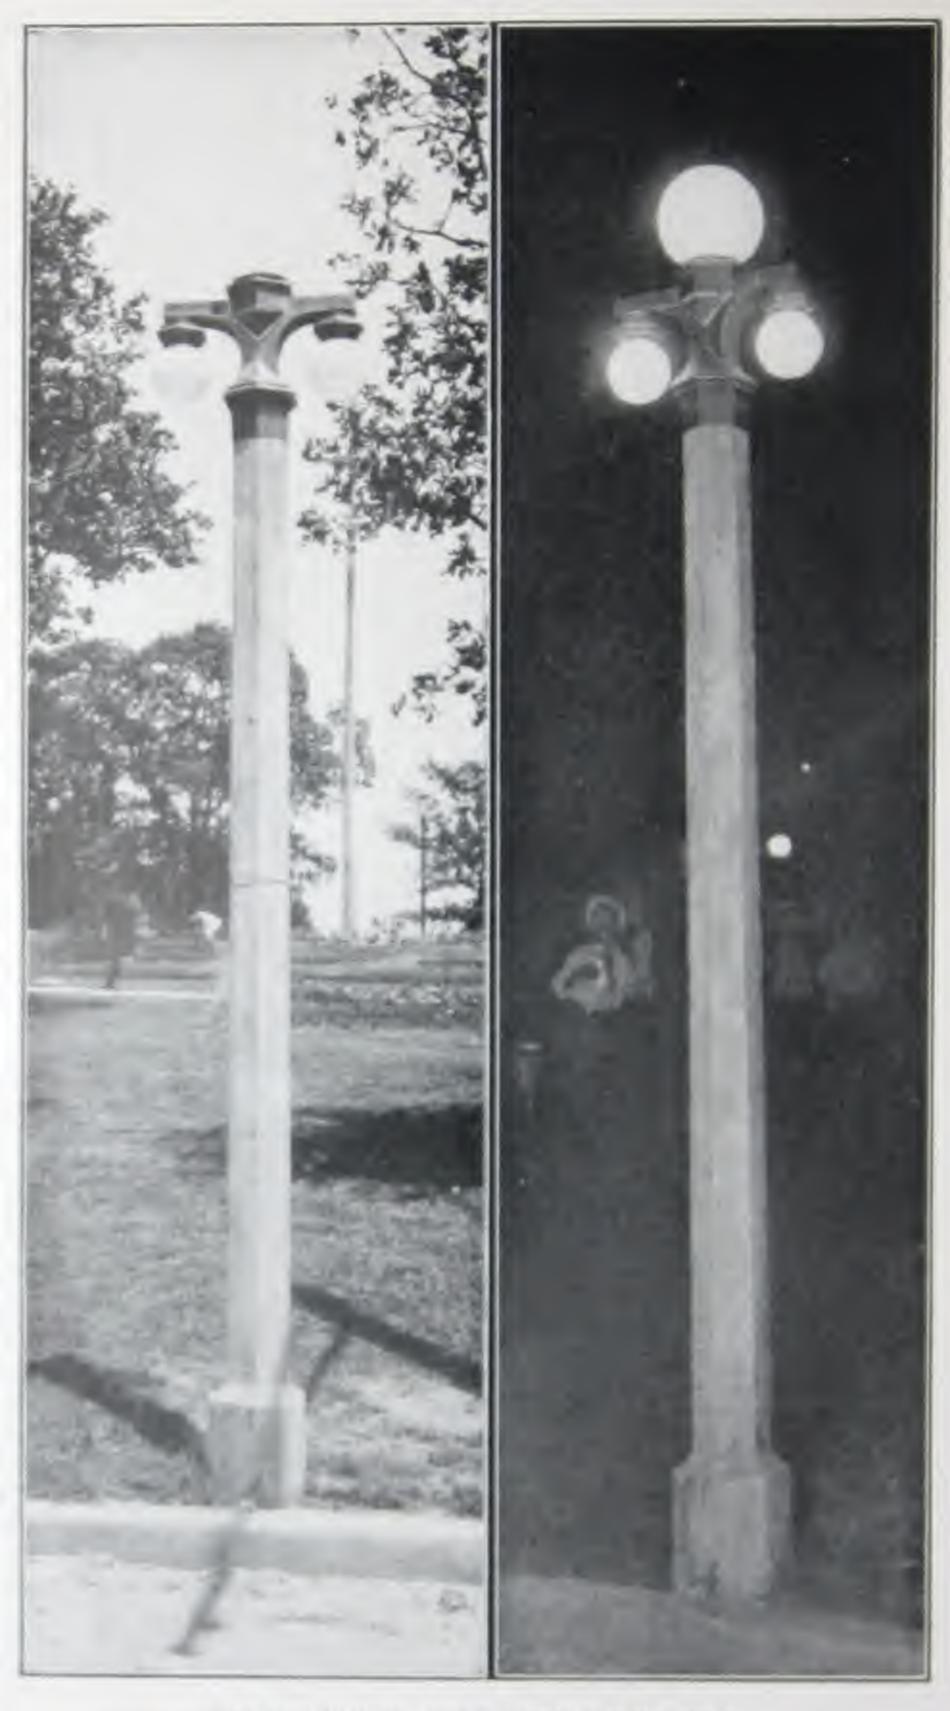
CONCRETE ELECTRIC LIGHT POLK.
